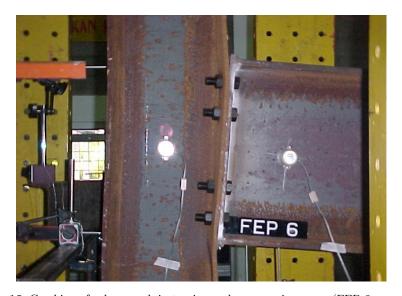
Crushing of column web in tension and compression zones (FEP 6 connection).
